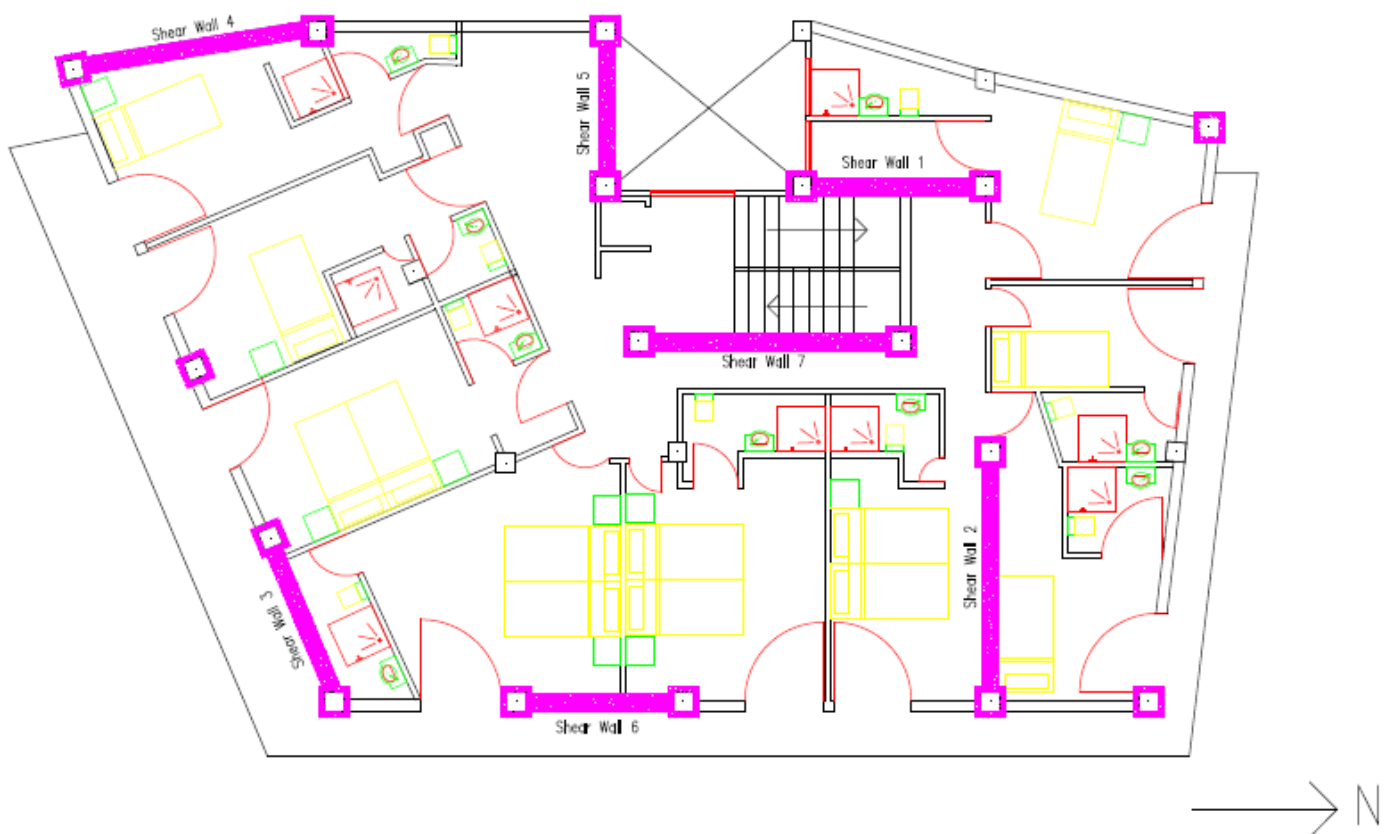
Structural Interventions- Addition of Shear walls and jackets
